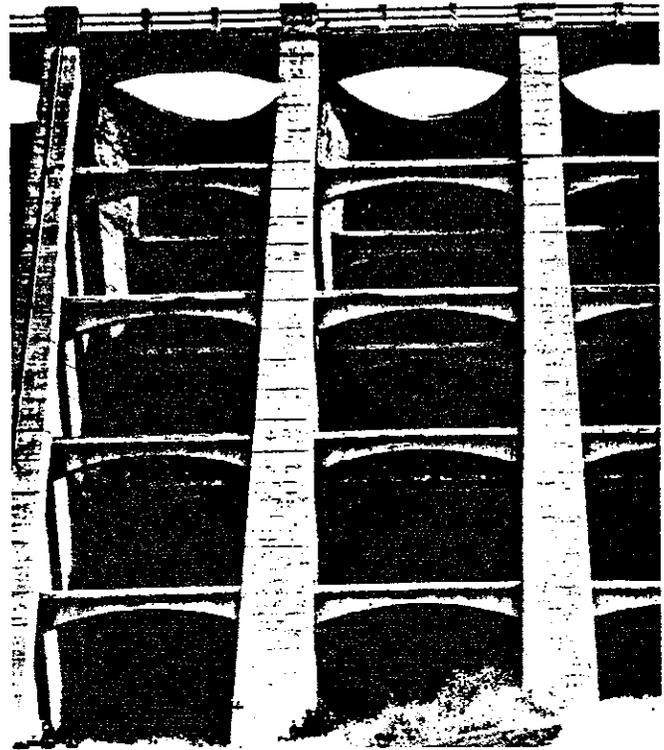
Detail of buttresses, strut-tie beams, and the downstream face of arch-ring walls. Efflorescence is evident in the white patches and streaks on the arch rings. 1973. (Courtesy of Jack E. Boucher)
